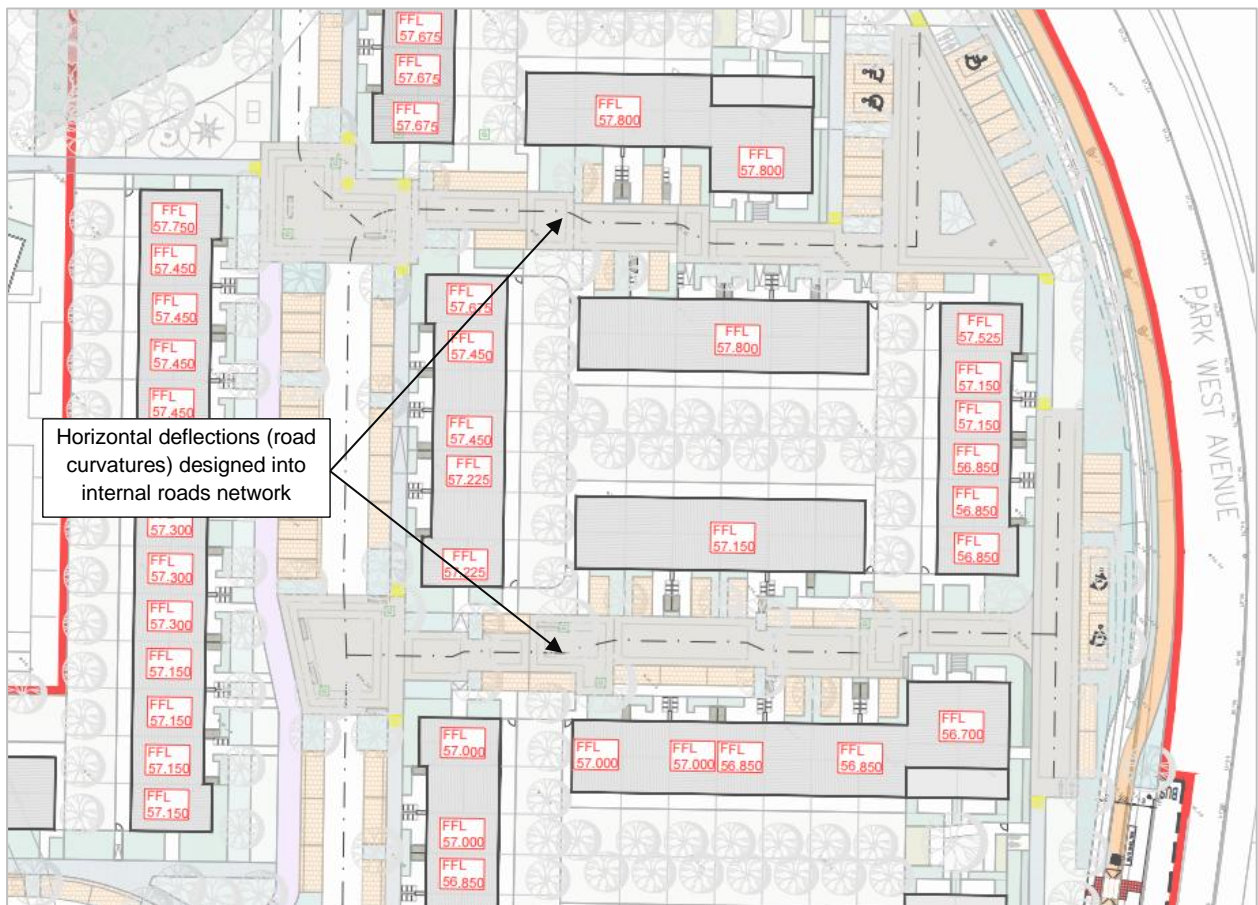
Examples of Horizontal Deflection (Road Curvature)
